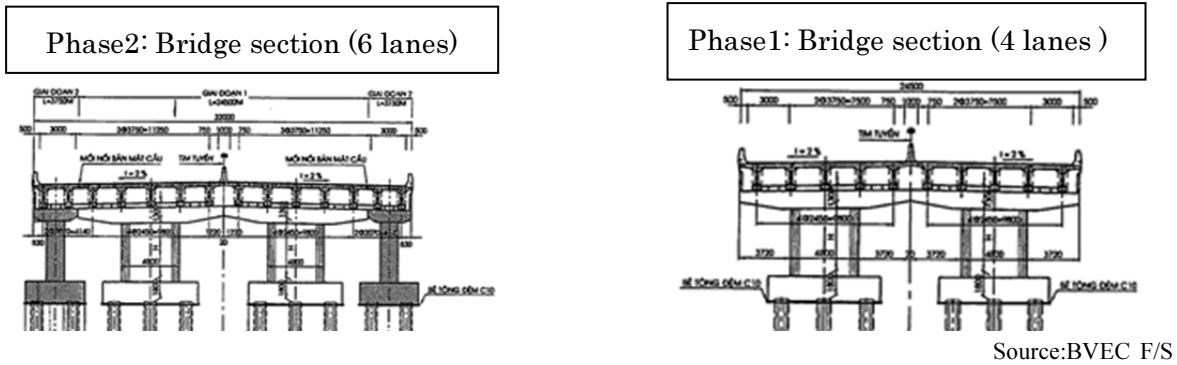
Typical Cross Section of Bridge Section for Bien Hoa IC (Km0+000) - Phu My IC (Km37+600)
